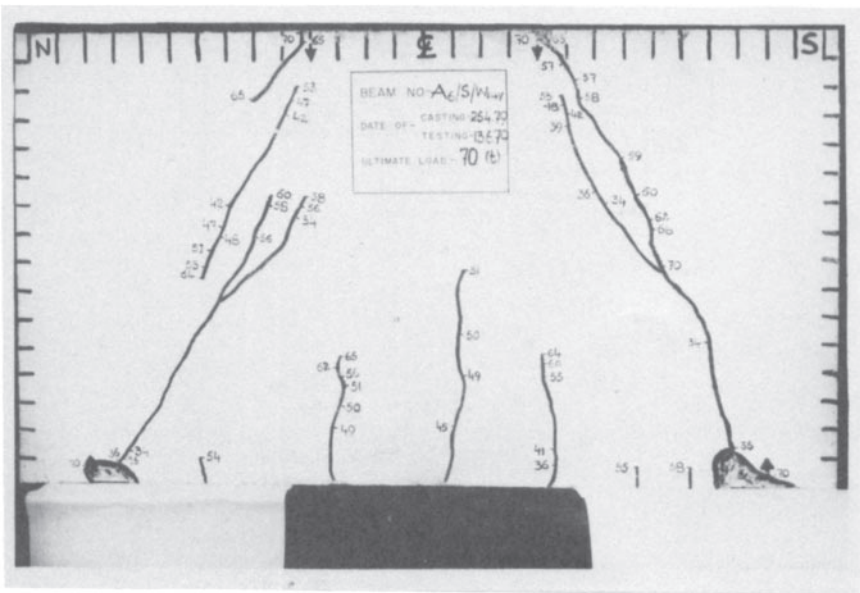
Crack patterns at failure of a typical deep beam with solid web (under two-point loading).
